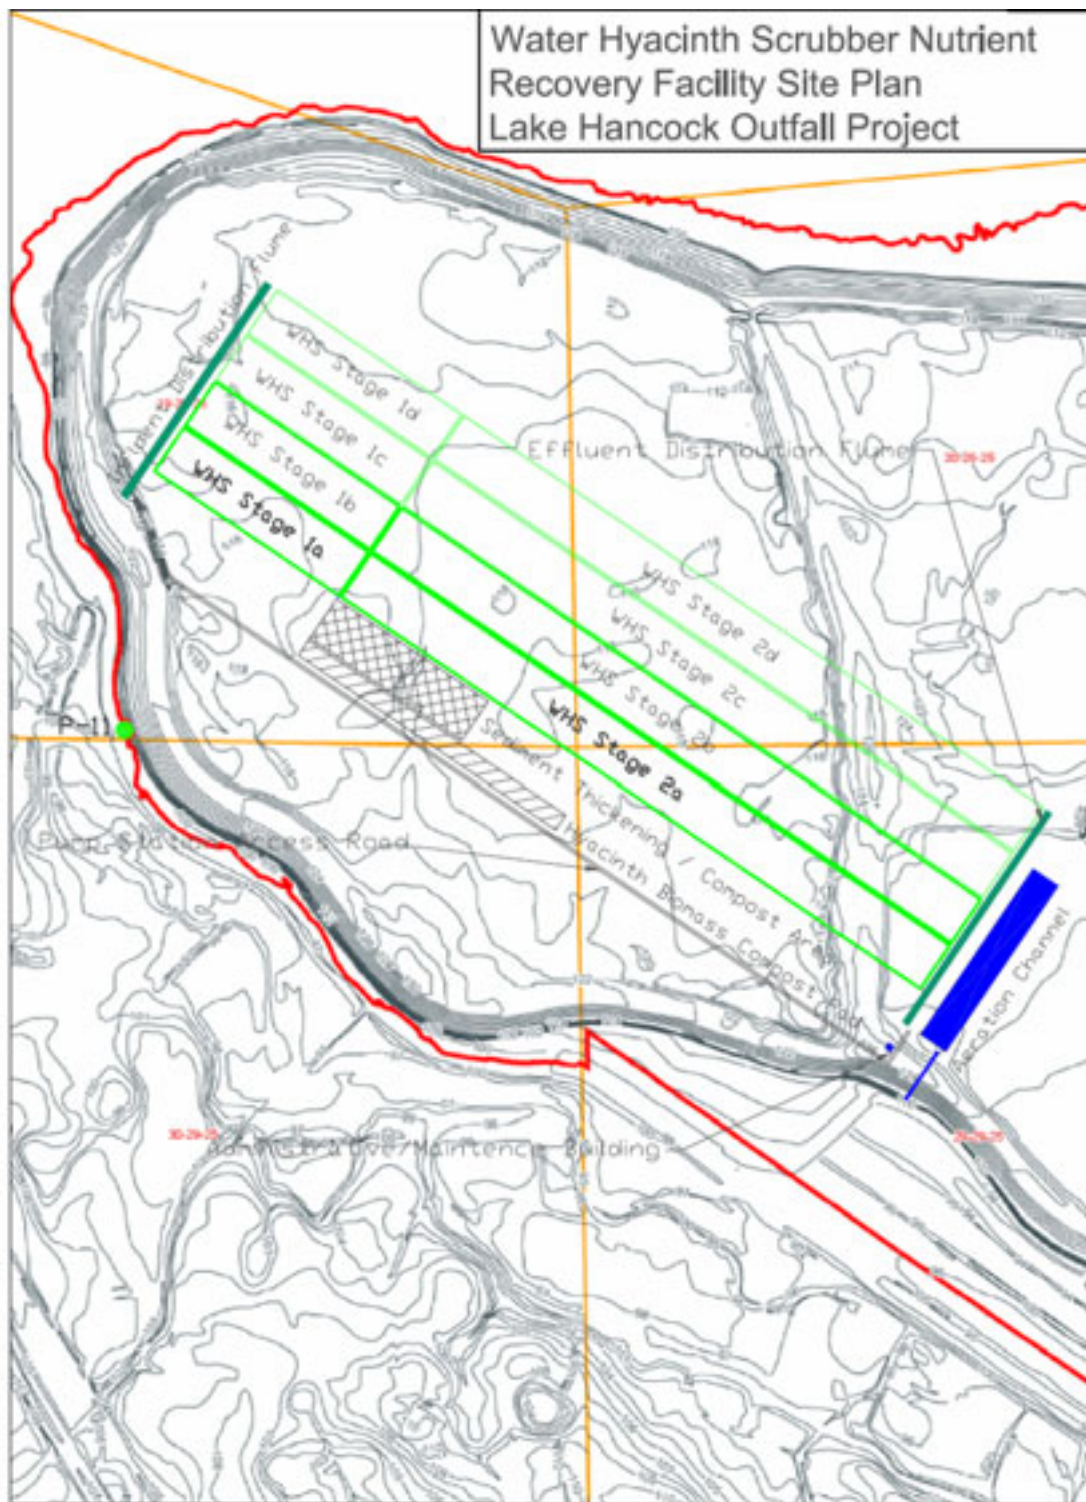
General Site Layout for 45% TN Reduction, 210 AcreWHST<sup>™</sup>. Drawing not to scale (HydroMentia, 2005a).
